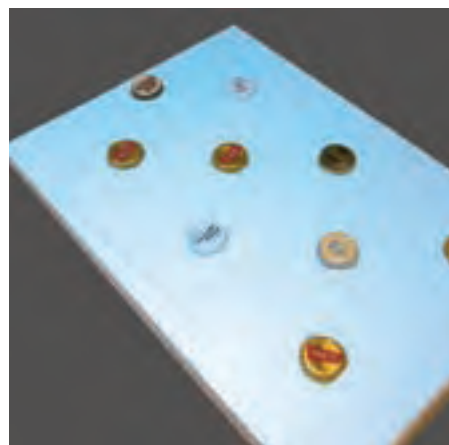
Vapor Closed Foil Faced Continuous Exterior Insulation – Note the draining building wrap providing redistribution of moisture. And, yes, we were also here earlier...”Joni Mitchell, Water and Walls, ASHRAE Journal, August, 2013).
